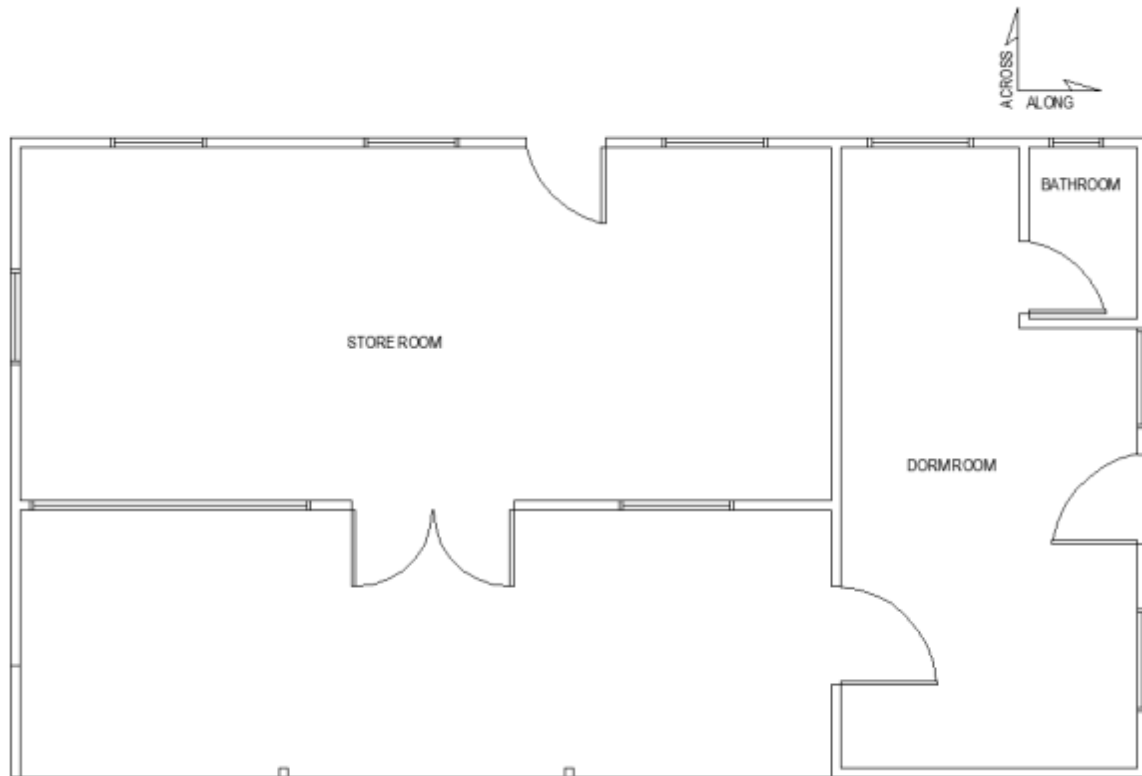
Duvauchelle Reserve Tennis Club Floor Plan
